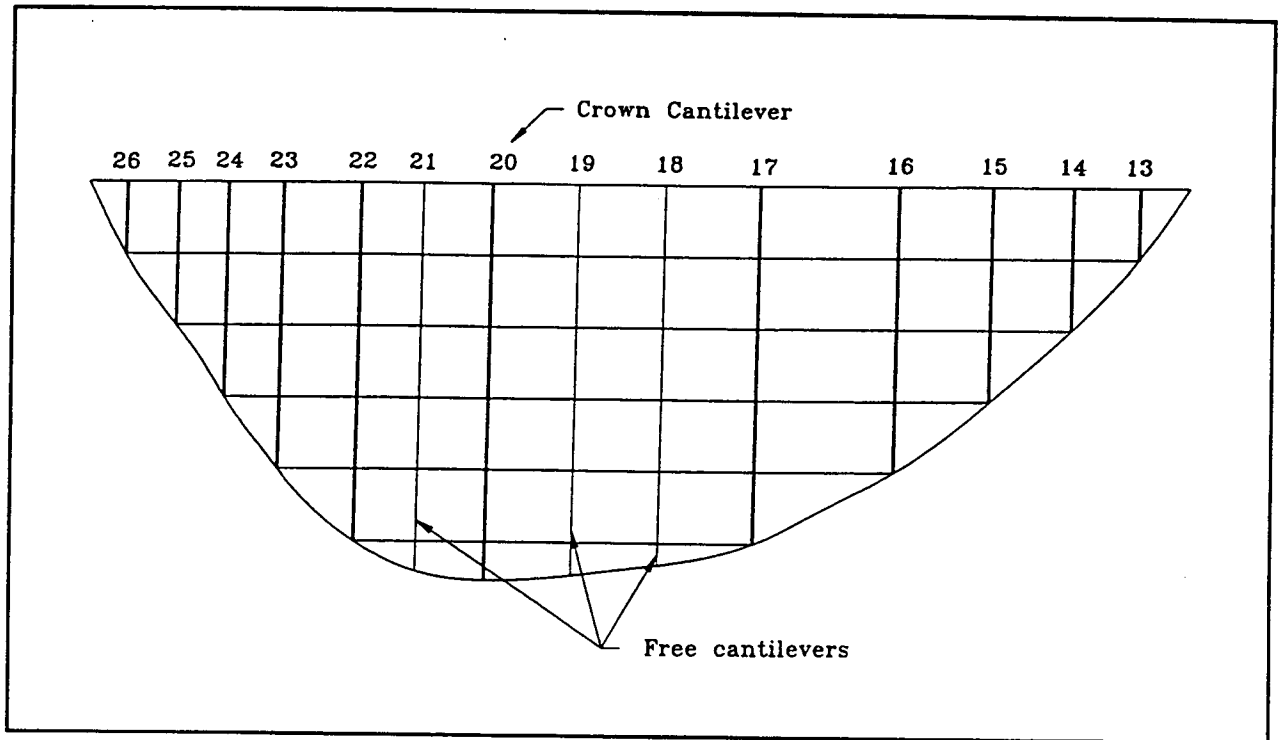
Free cantilevers for two-centered layout at highly unsymmetrical site
